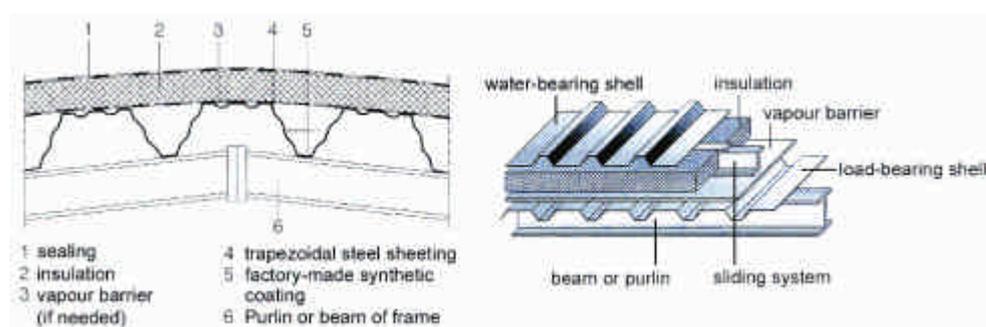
Common roofing systems in industrial halls in Germany using trapezoidal steel sheeting, [3]
